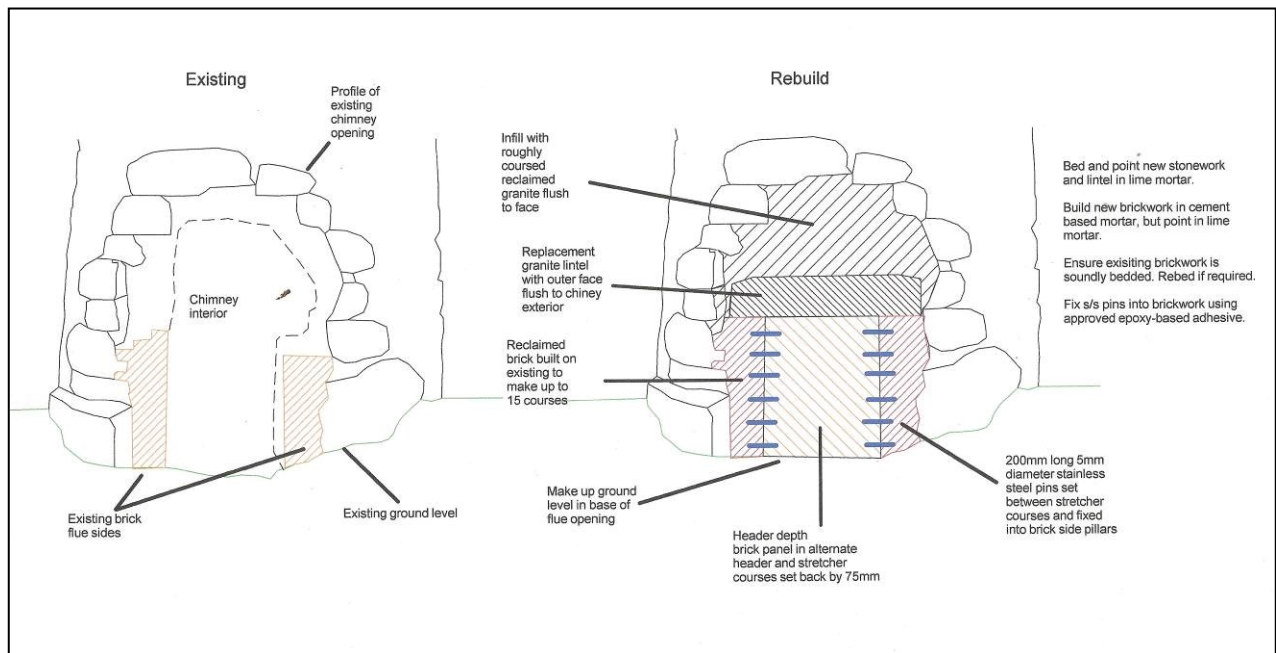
Detail of the method for rebuilding and infilling the flue opening to the chimney.
